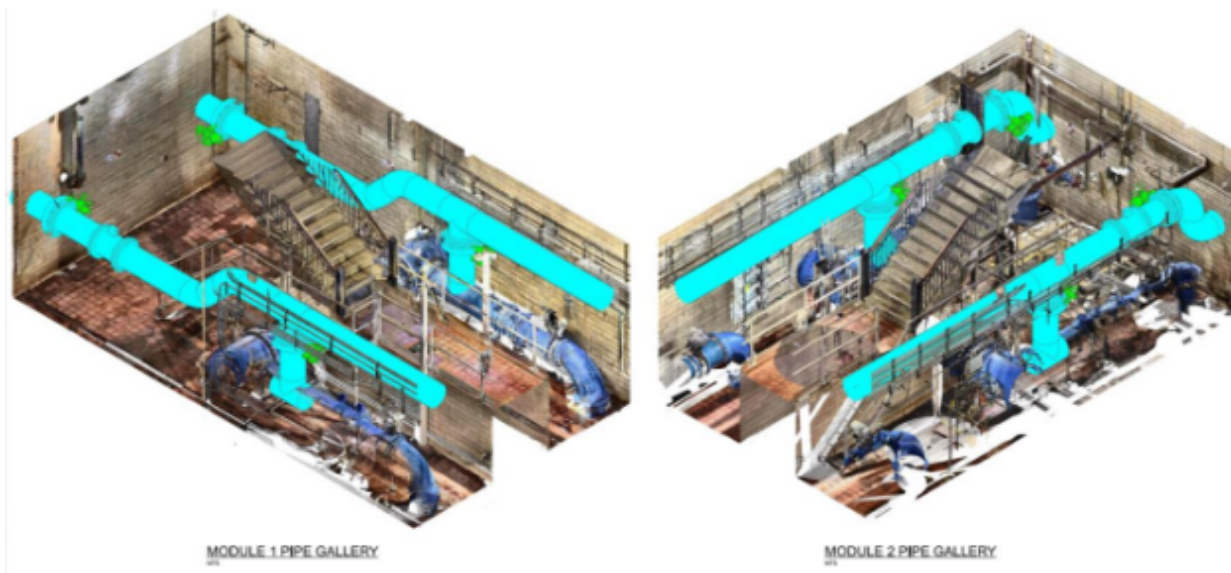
FTW Piping Conceptual Design (Source: CH2M Filter-to-Waste report, 2021)
